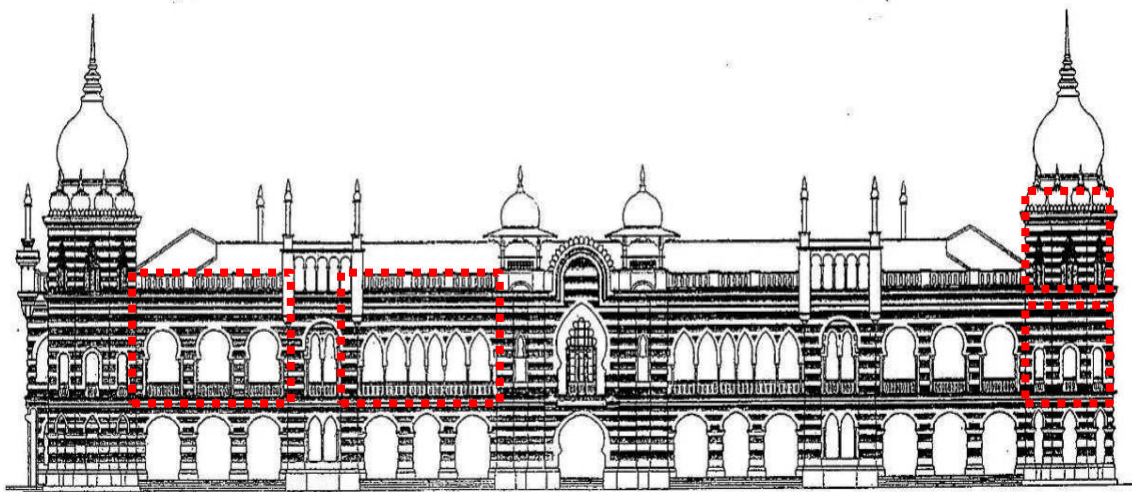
Front Elevation showing horseshoe, pointed, round and 'Shahjahani' arches (Anuar 2011).
